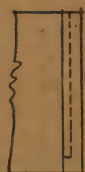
Plan Showing Suggested Method of Housing Ends of Shelves
